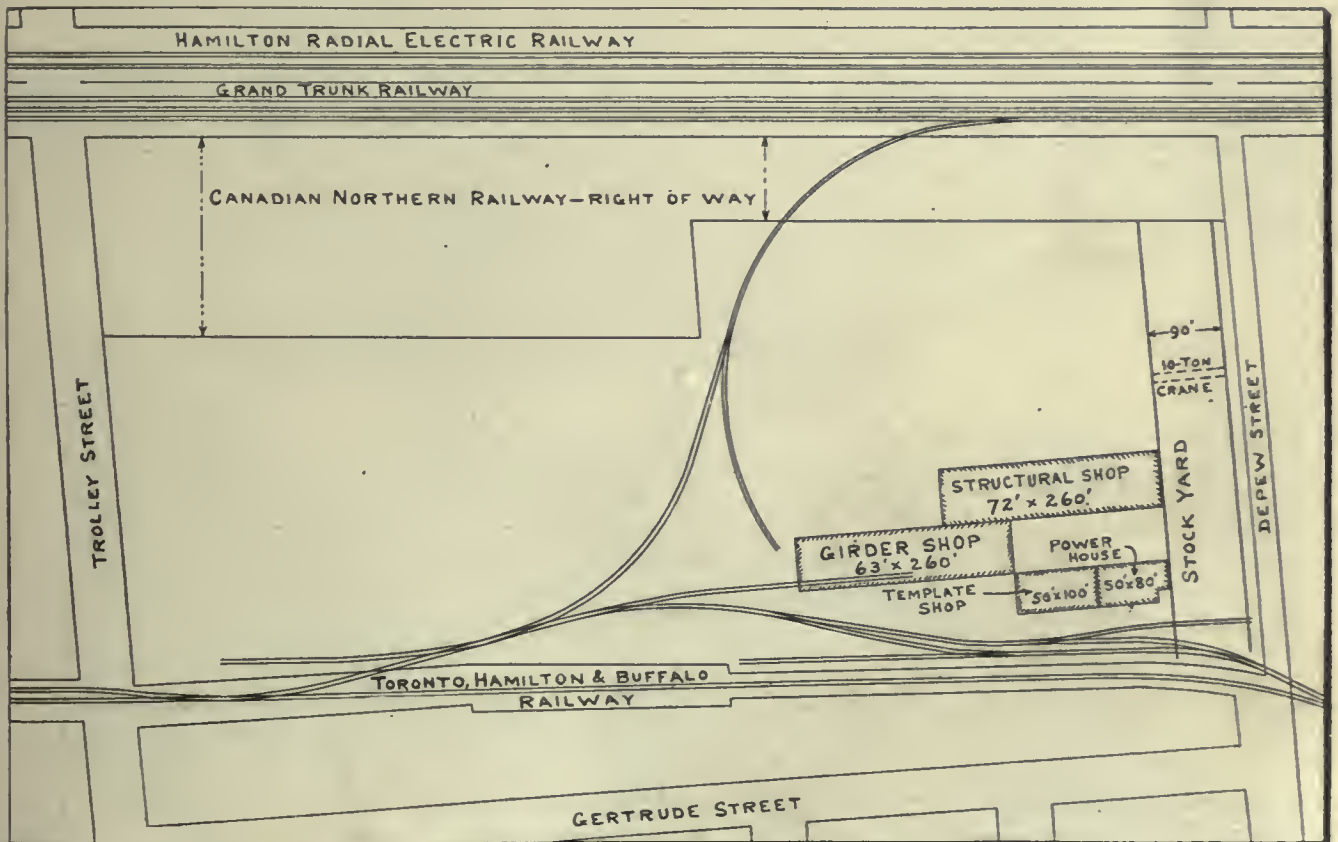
LAYOUT OF NEW SITE, SHOWING THE LARGE AMOUNT OF SPACE AVAILABLE FOR FUTURE EXTENSIONS. HAMILTON BRIDGE WORKS CO., LTD.
